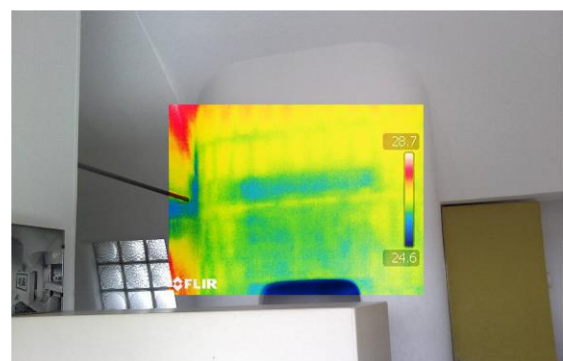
© A-BIME: Infrared camera picture: structure of the shower wall
